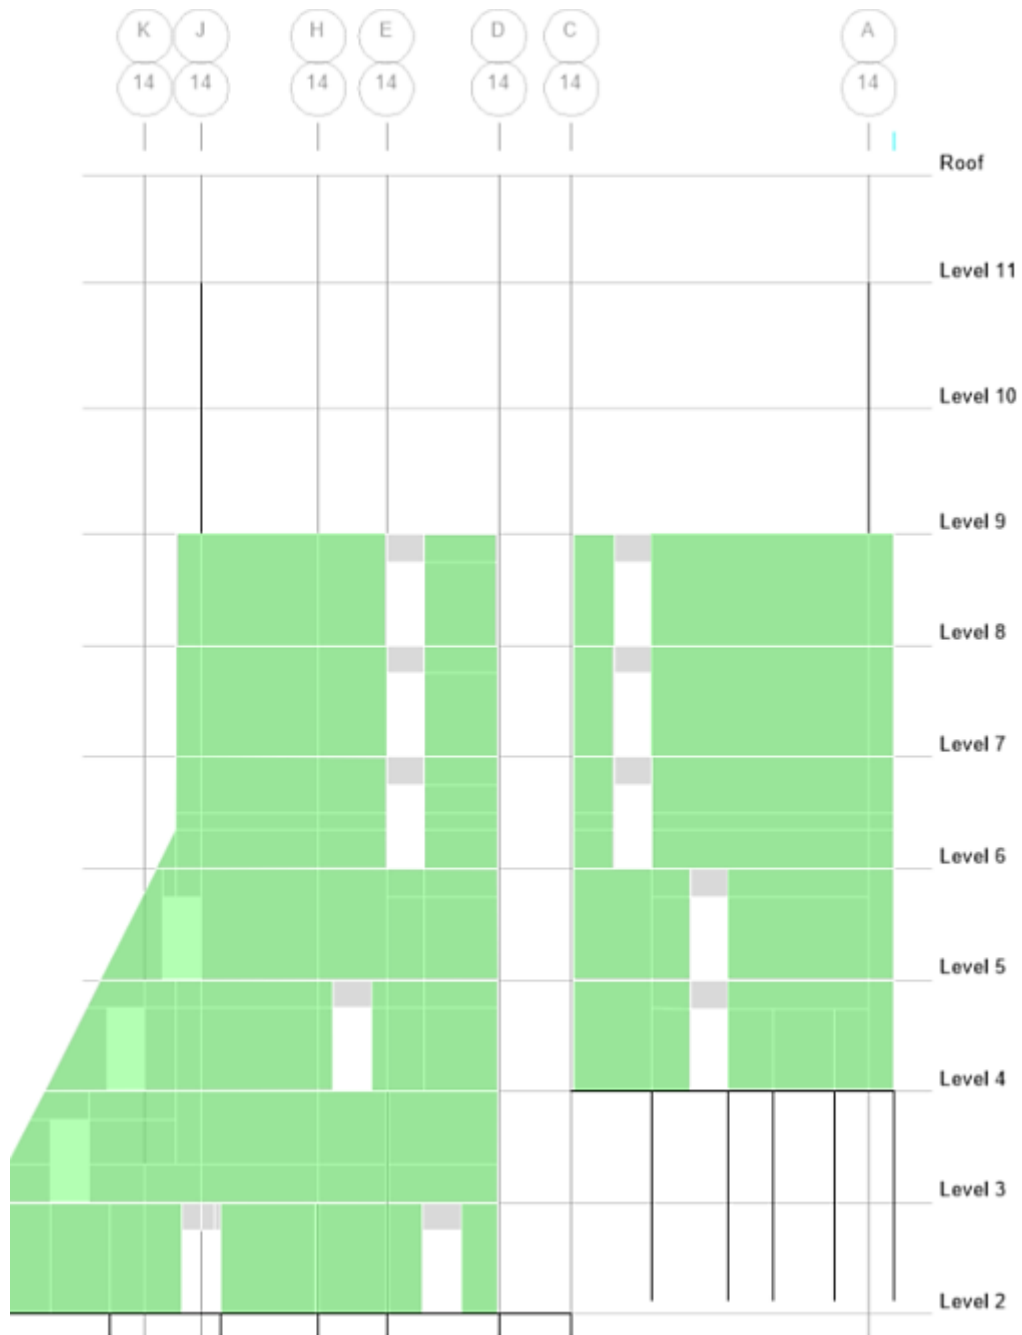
, Gridline 14 Transverse Direction Wall – South Structure
